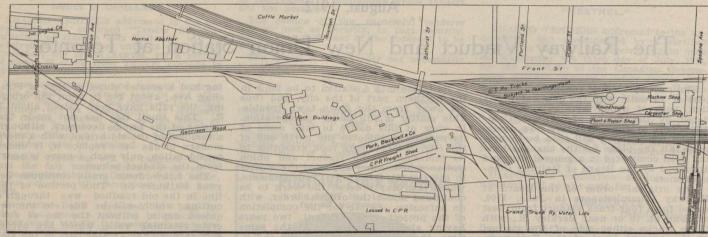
Sec. 1. Plan of Viaduct Scheme from C.P.R. Diamond Crossing to Spadina Ave.
